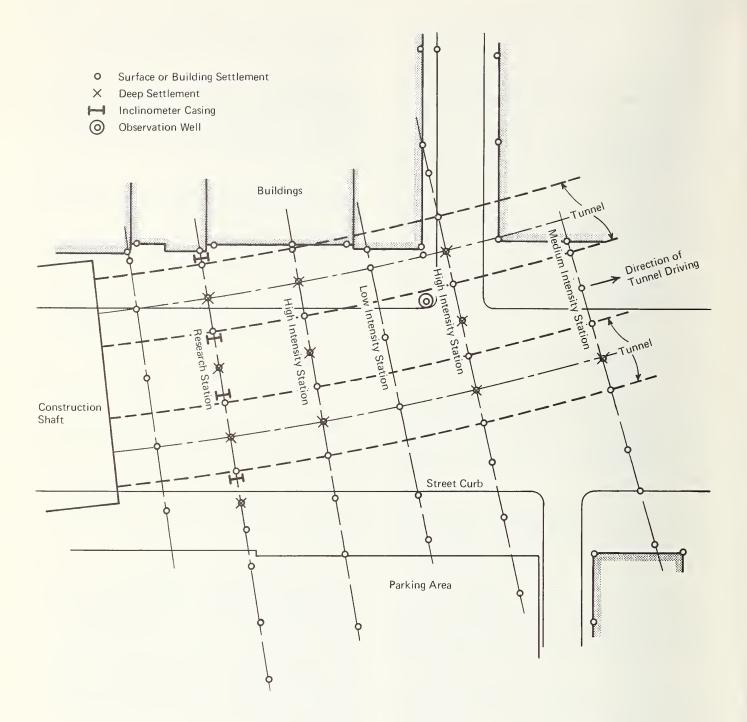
Plan Showing Typical Layout of Instrumentation.
